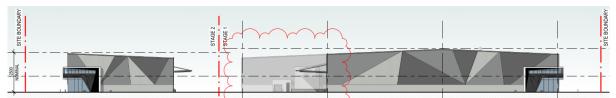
North Elevation – Alfred Road frontage (Source: Watson Young Architects)
